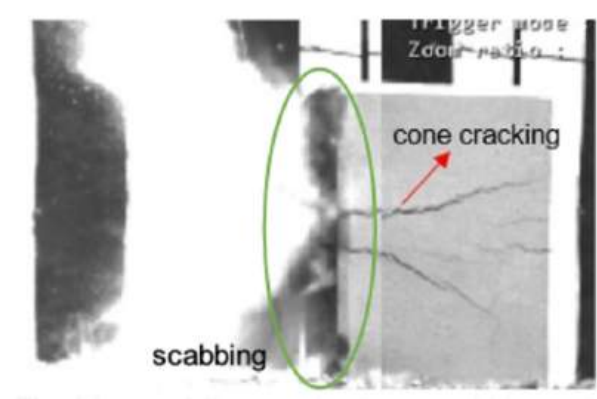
Impact failure mechanisms: scabbing and cone cracking
